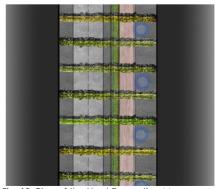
Plan of the Heat Prevention Measures on Prinzenstraße, Area A (Masterplan) (own depiction)
